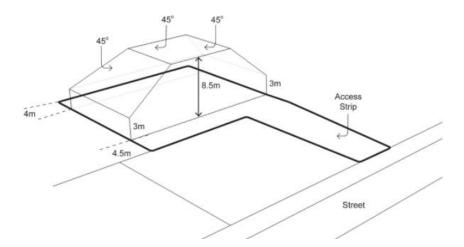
Diagram 10.4.2D showing internal lot building envelope (source: Brighton Interim Planning Scheme 2015)
